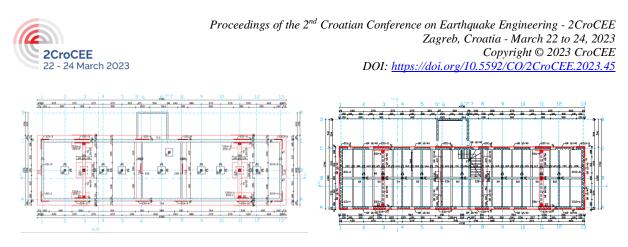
Strengthened and existing state at plan of foundations (left), ground floor and storey (right)
